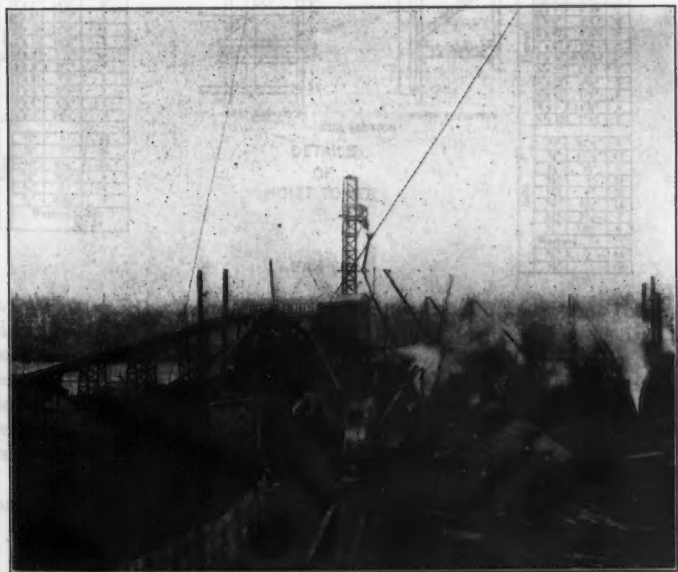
WARDS ISLAND UNLOADING PLANT.
